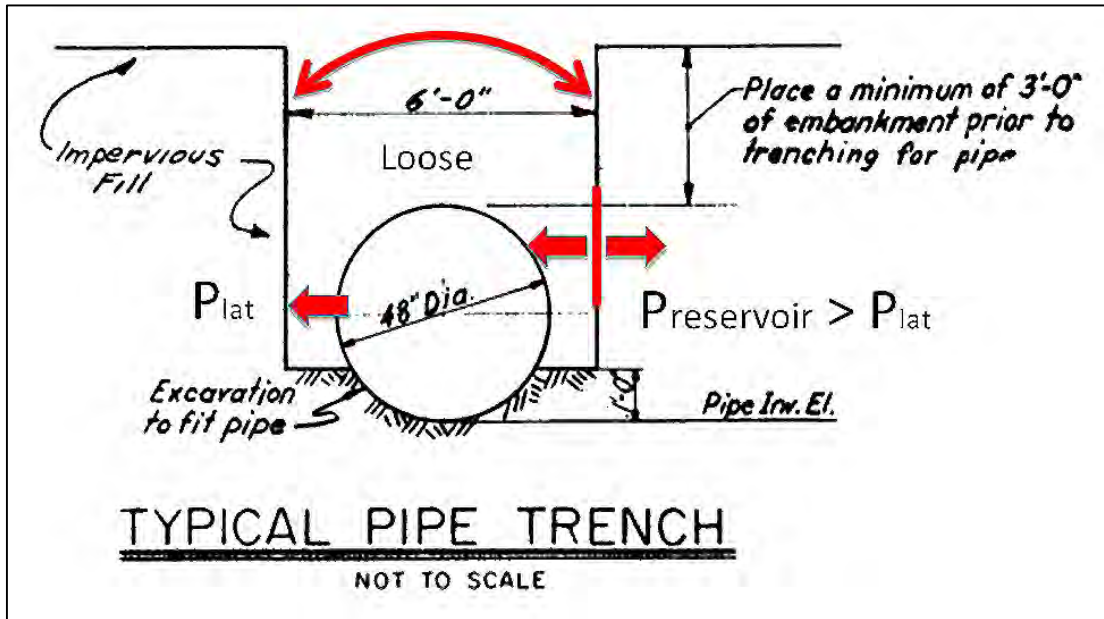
Example of stress arching and hydraulic fracture at a conduit.
